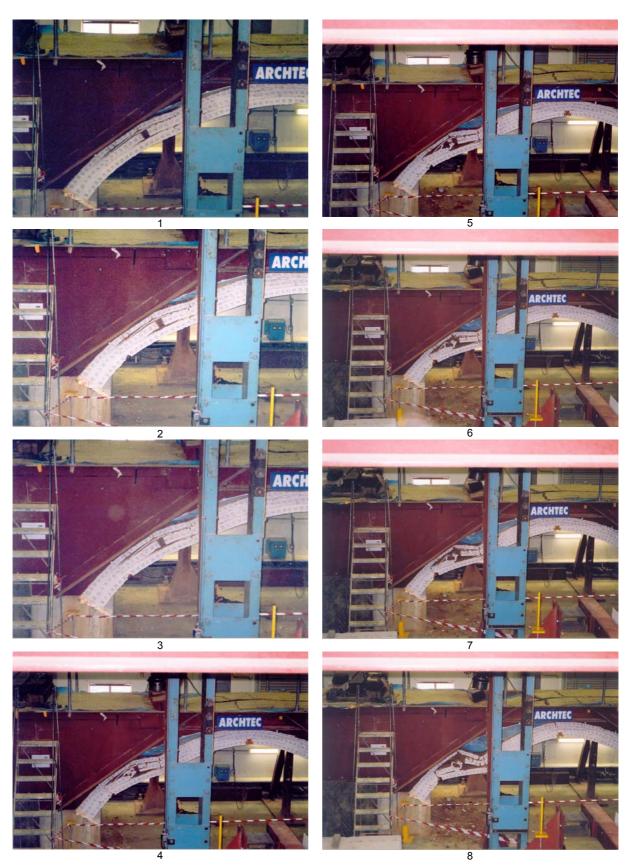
Failure of strengthened arch observed in the second Archtec test at TRL (Note that between each stage the arch remains stable under a minimum of its own self weight and further load/displacement had to be applied via the jack to progress the failure)
